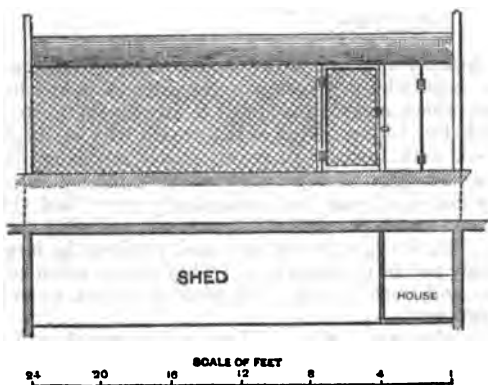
FOWL-HOUSE—PLAN AND FRONT ELEVATION.
